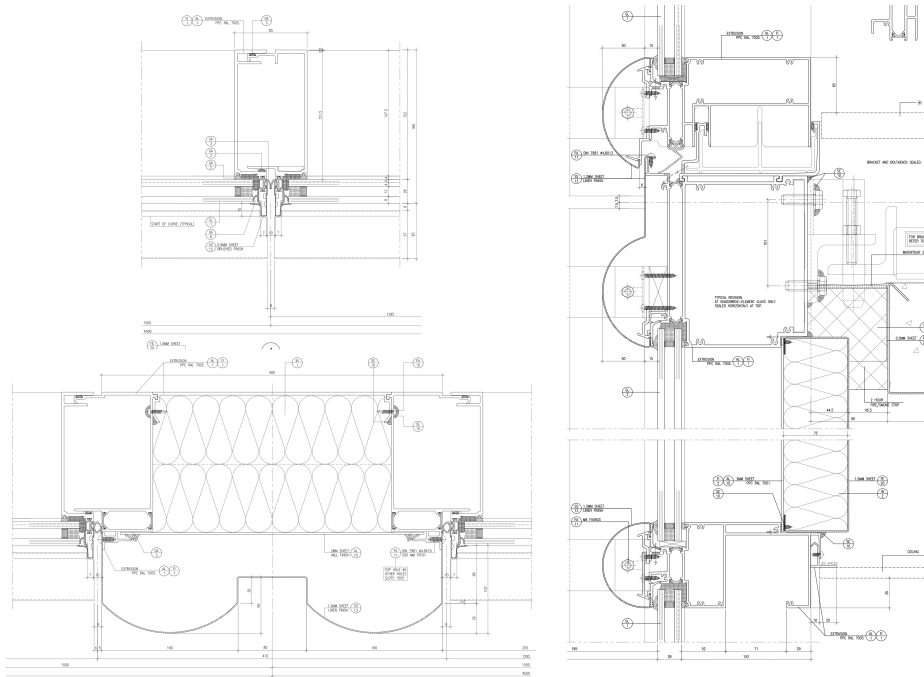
Horizontal and vertical framing detailing, made by Scheldebouw (2002)
